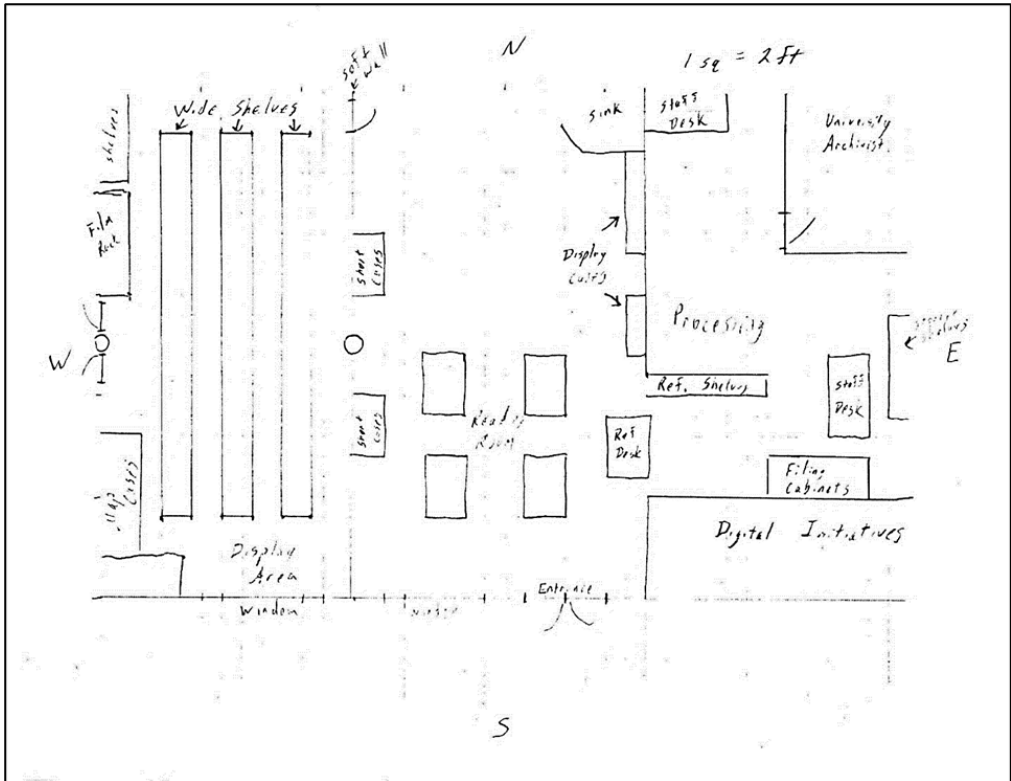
Sketch of new space layout for the CWU Archives, design by M.R. Blackson.
